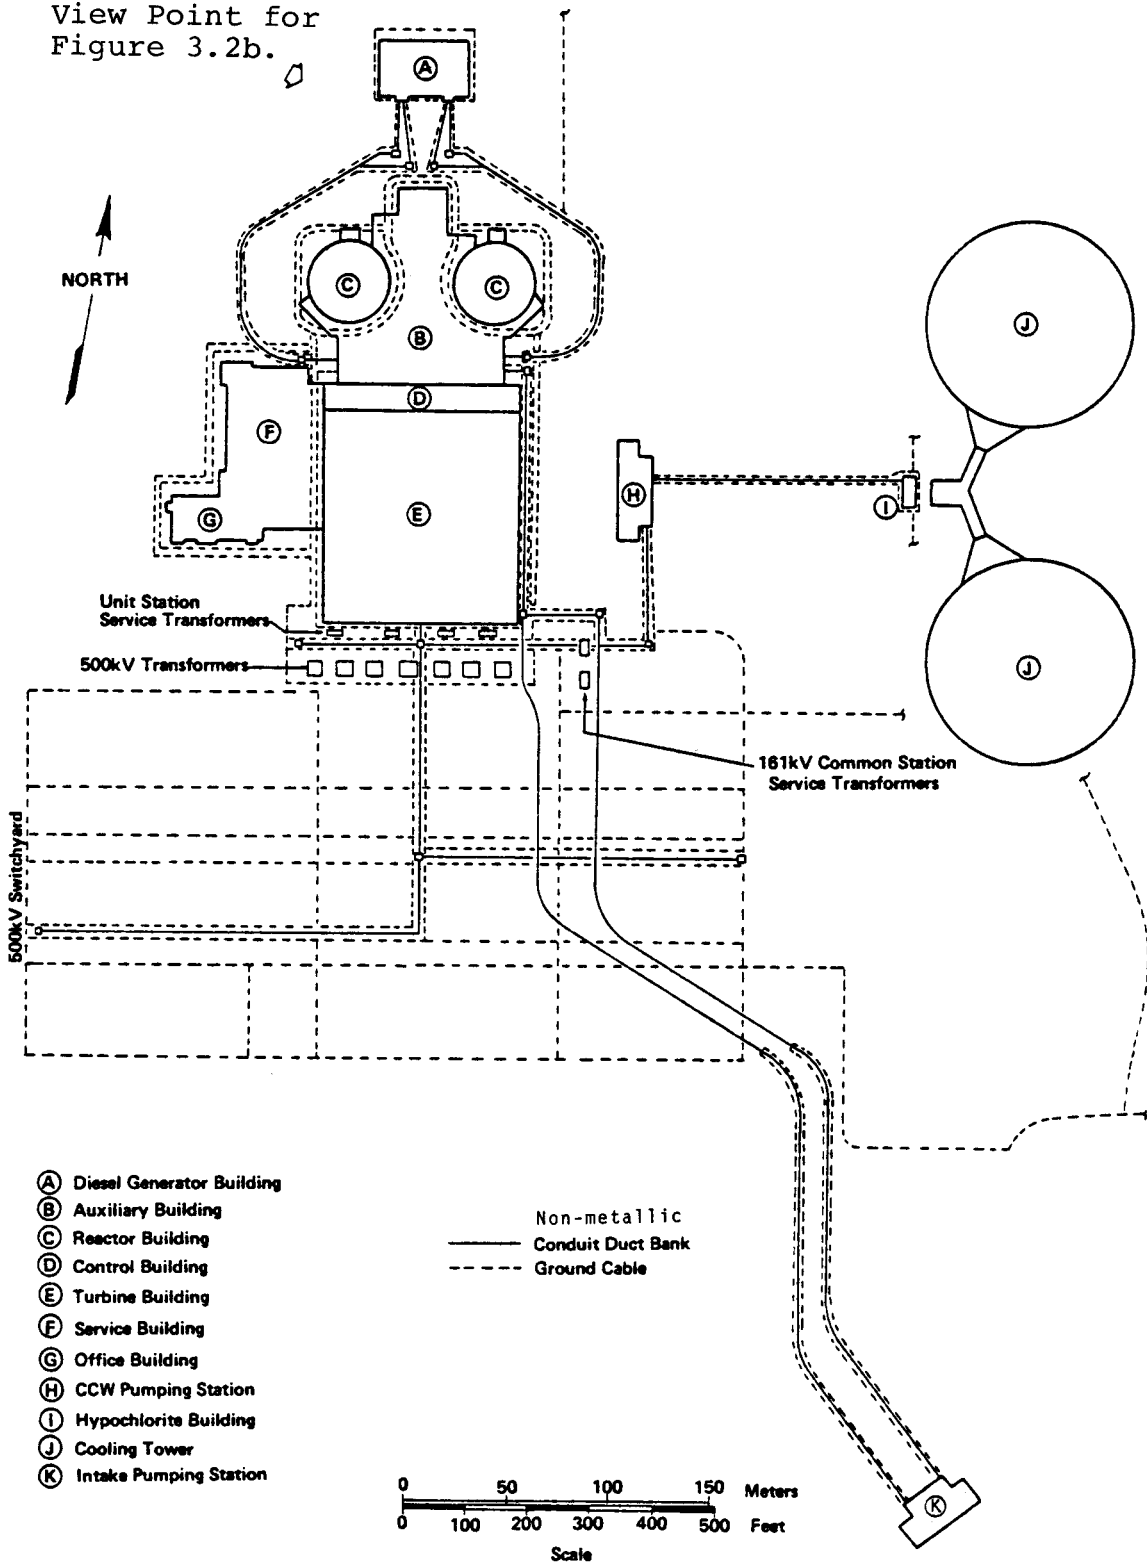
Plot Plan Watts Bar Nuclear Plant.
